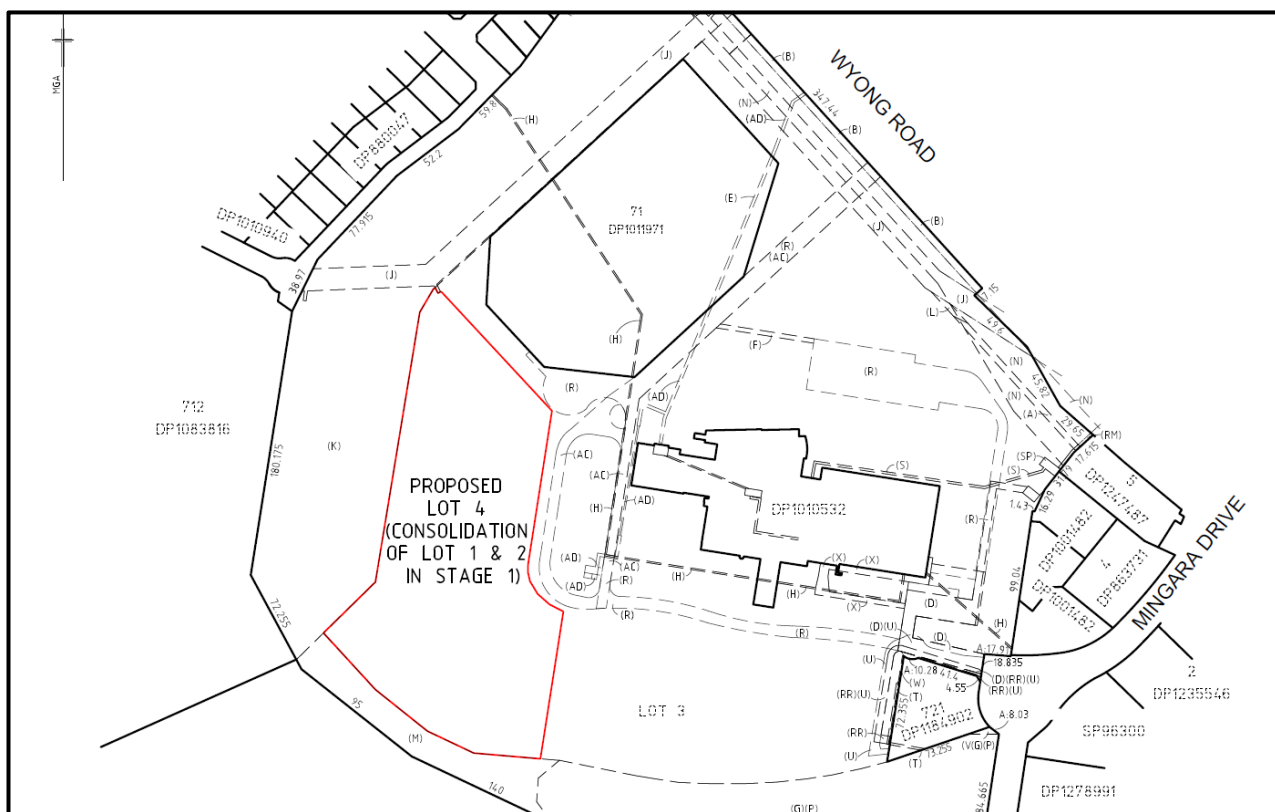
| Lot 4 subdivision plan (source: Applicant EIS)
